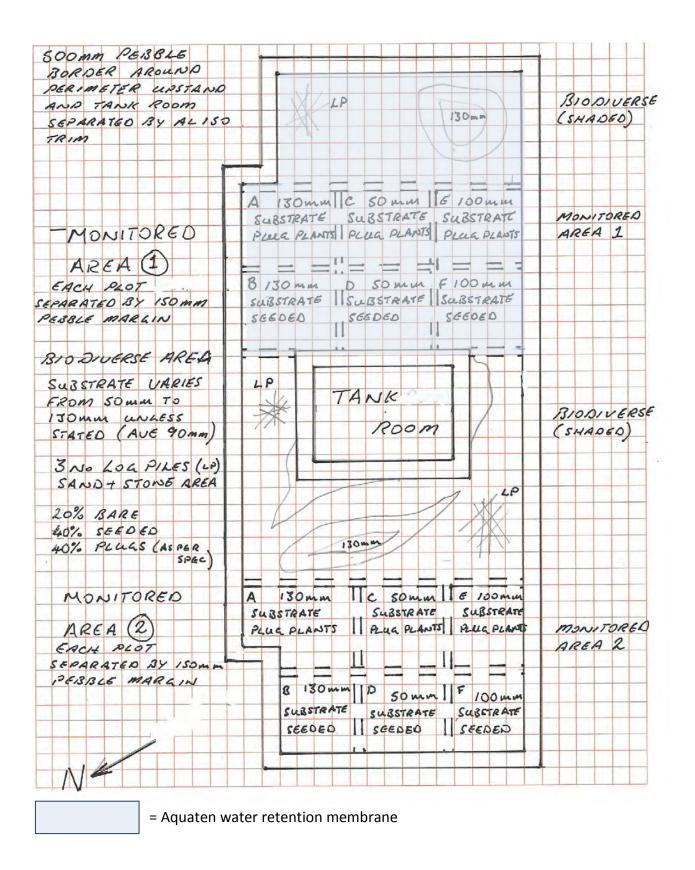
Layout of experimental green roof on Richard Knight House, London Borough of Hammersmith and Fulham.
